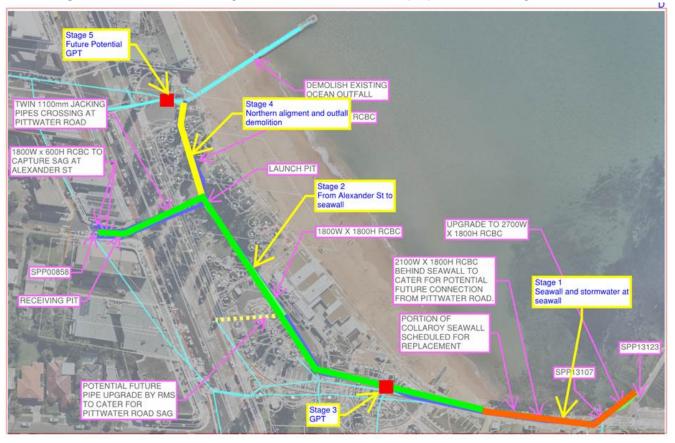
Proposed Stage 1 and potential future stormwater network works
